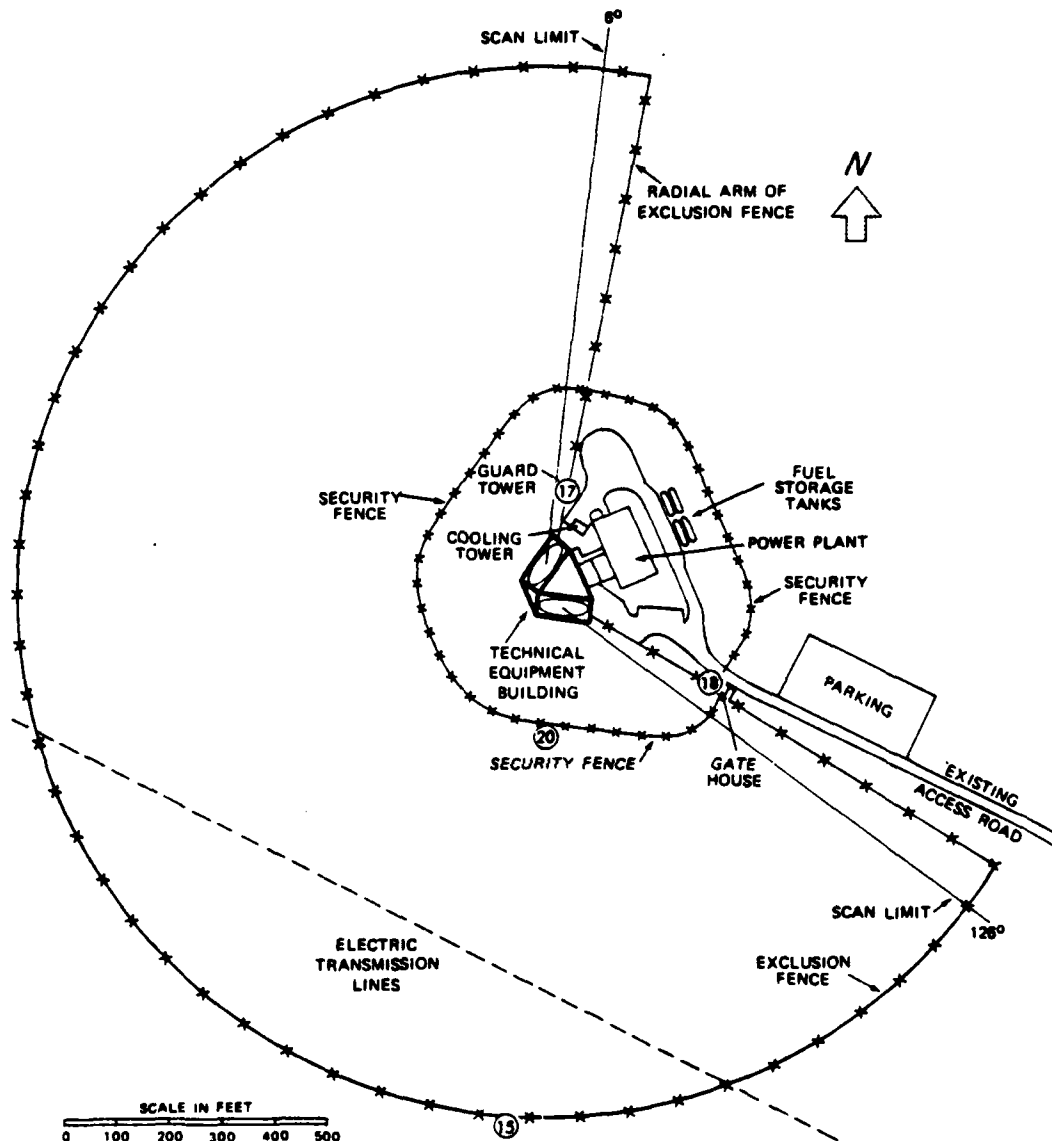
PAVE PAWS SITE PLAN AT BEALE AIR FORCE BASE -
